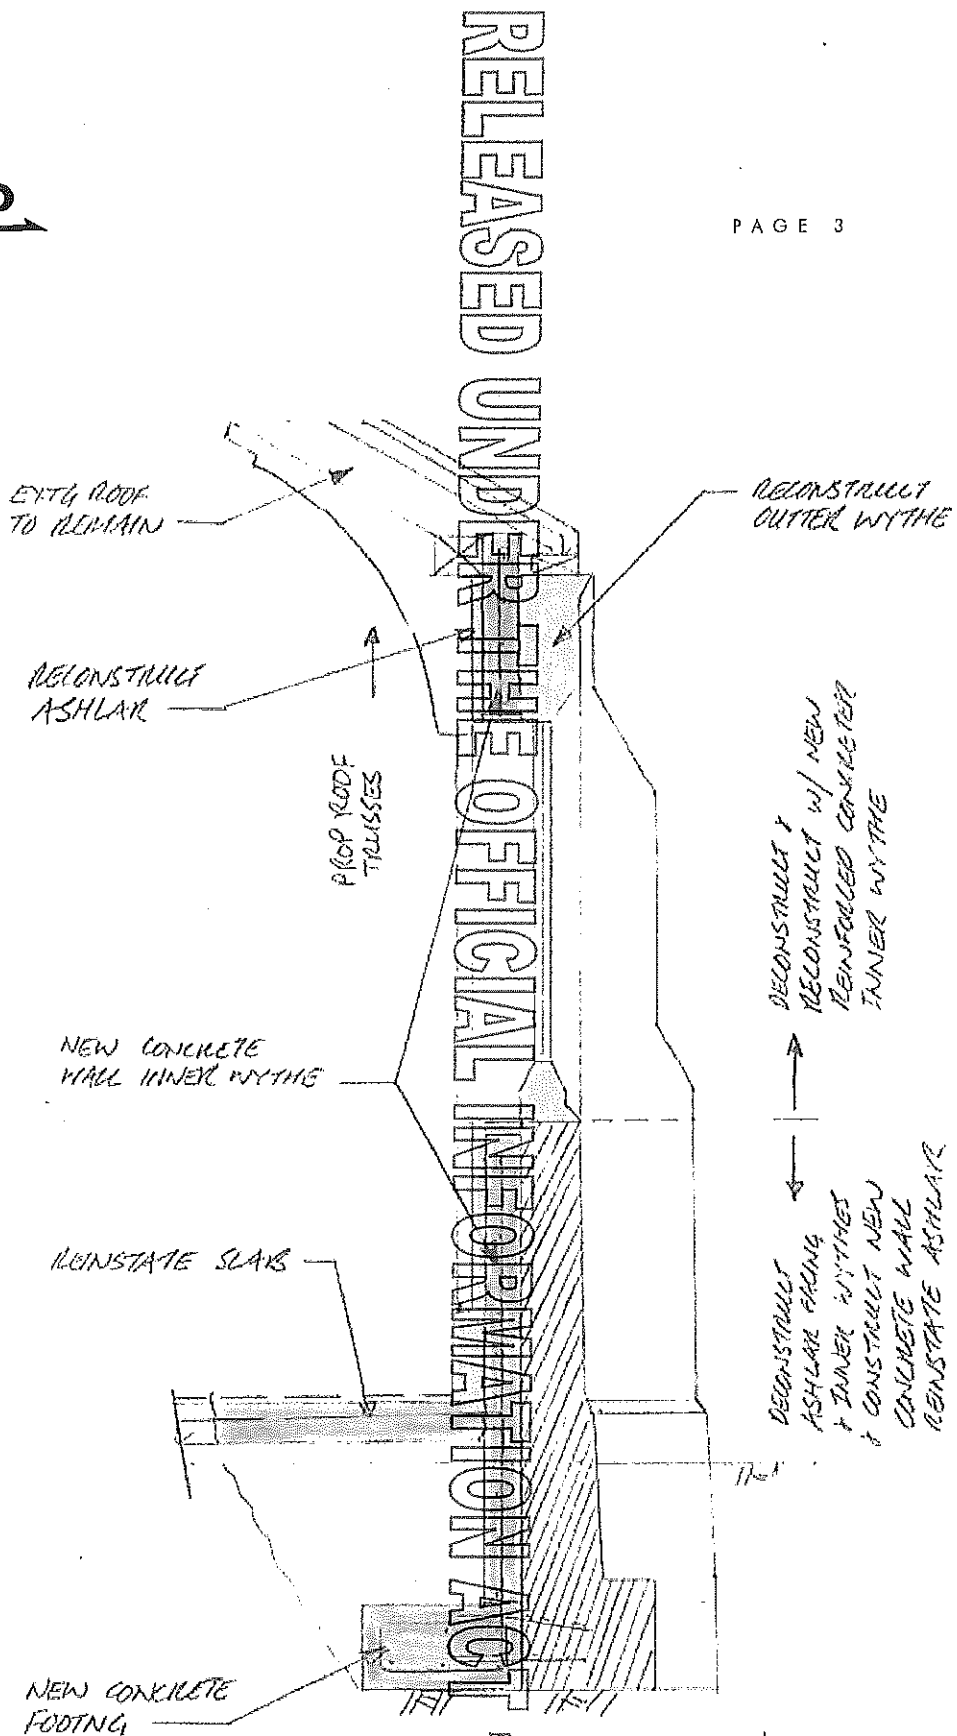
Proposed Perimeter Wall Reconstruction Methodology
